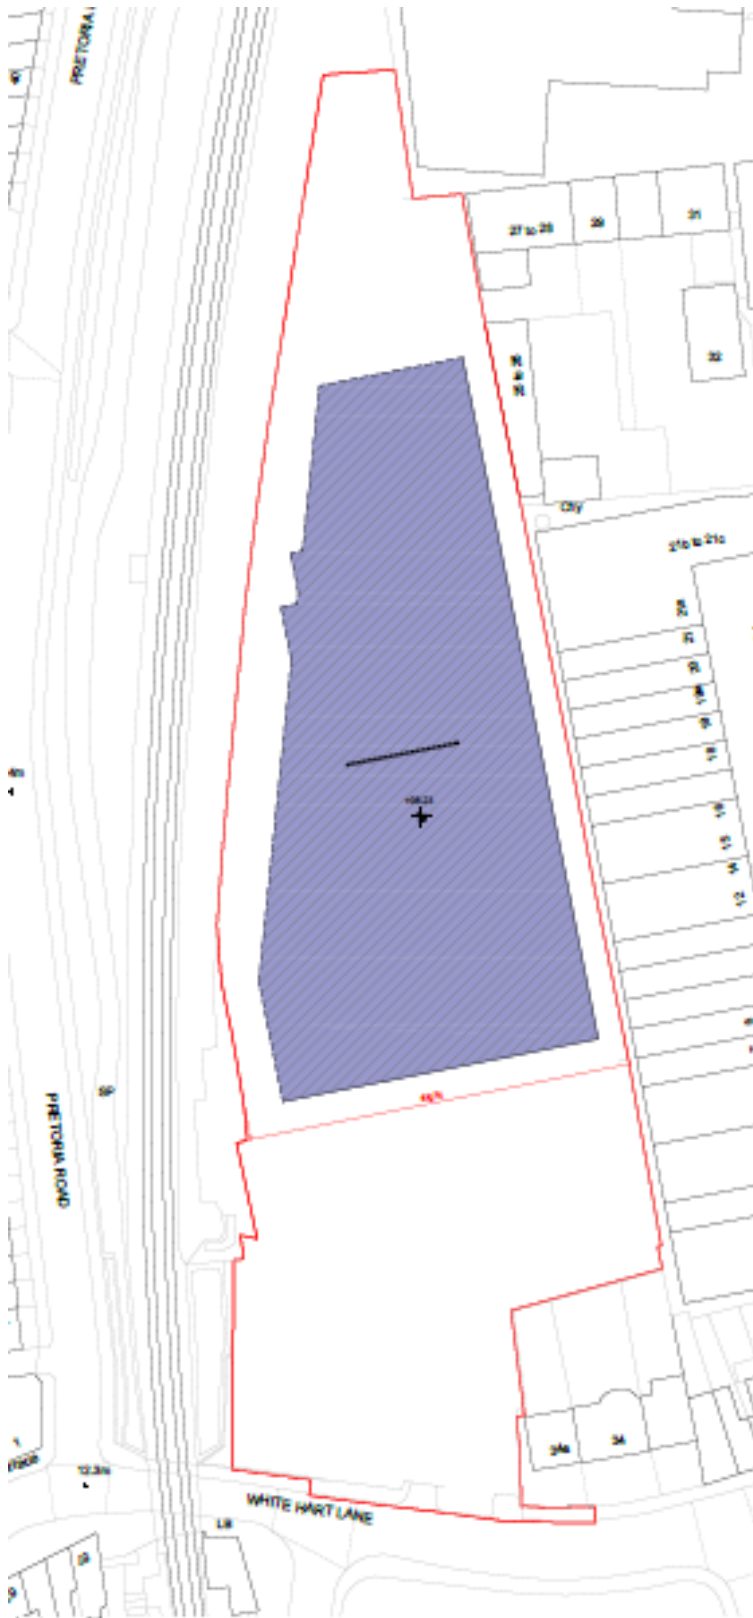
Parameter Plot Plan – Basement Extent (Source: Applicant)
